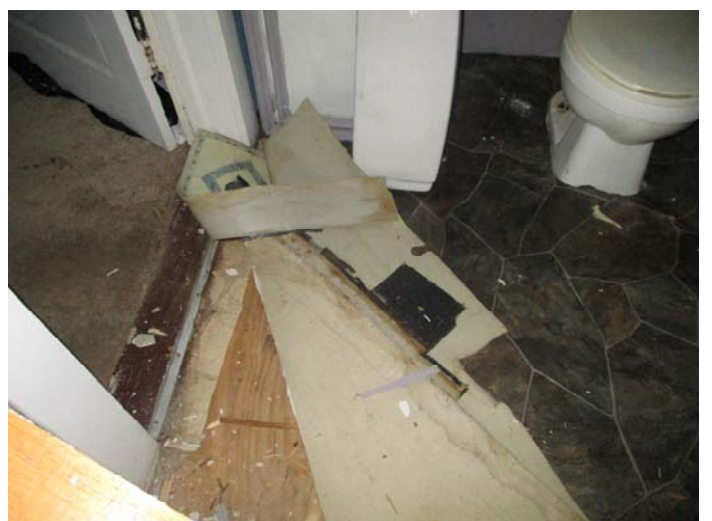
4 layers of vinyl flooring with no adhesives in the back bathroom
